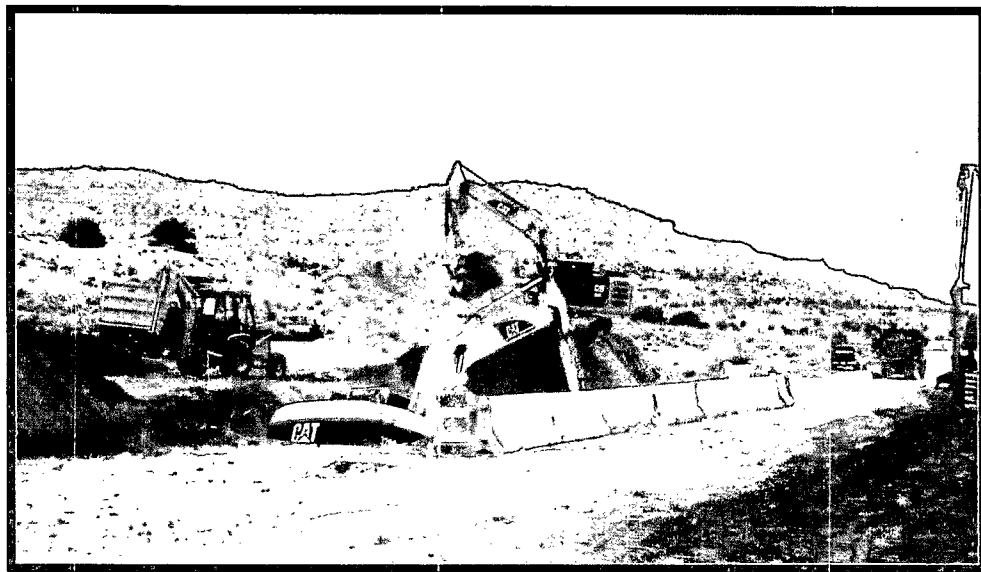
A second track mounted hoe was used to keep up with soil excavation and removal.
